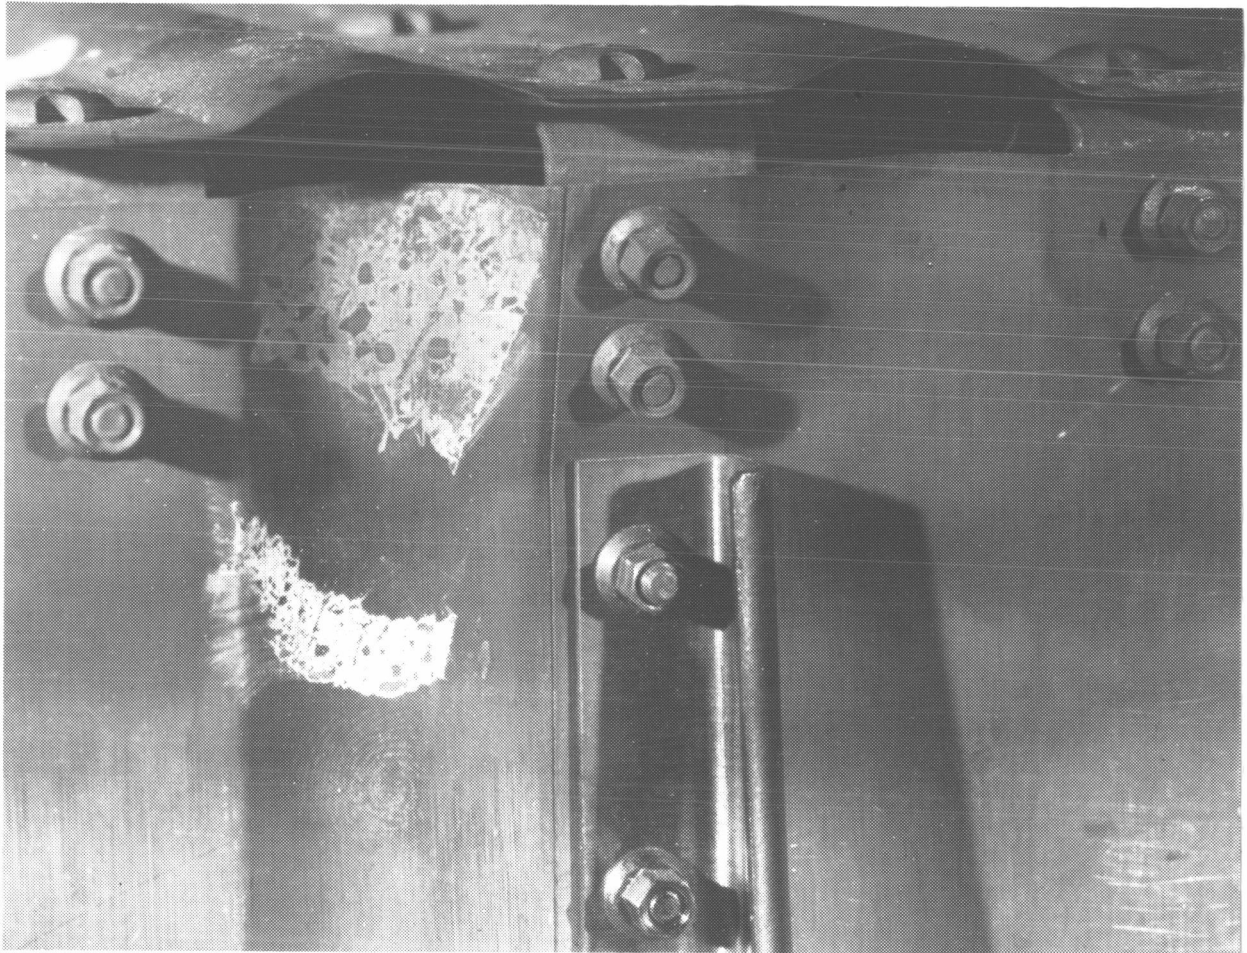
Post-Test Inspection Surface Map, Run No. 100
